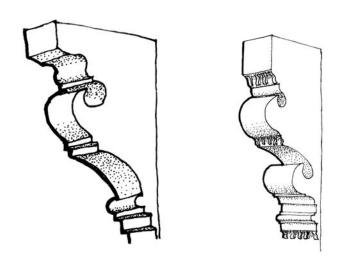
Decorative (phase 3) horned eaves (left) and jetty (right) brackets on 29–31 West Stockwell Street (corpus no. 104)
